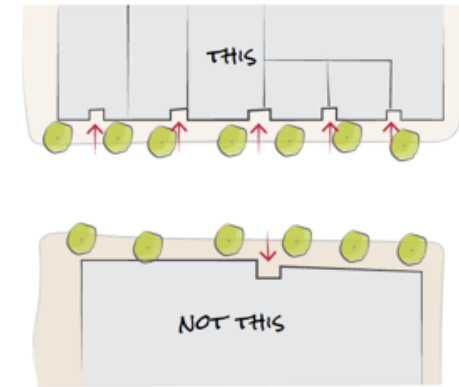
Design buildings to have multiple, smaller storefronts (7.2.d).
